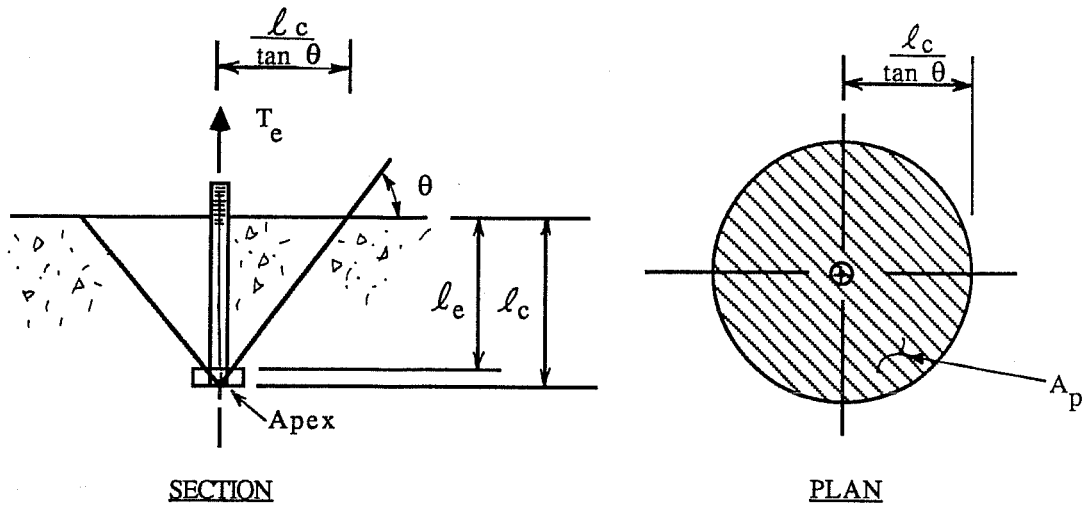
Design Pullout Cone for Cast-in-Place Anchors
